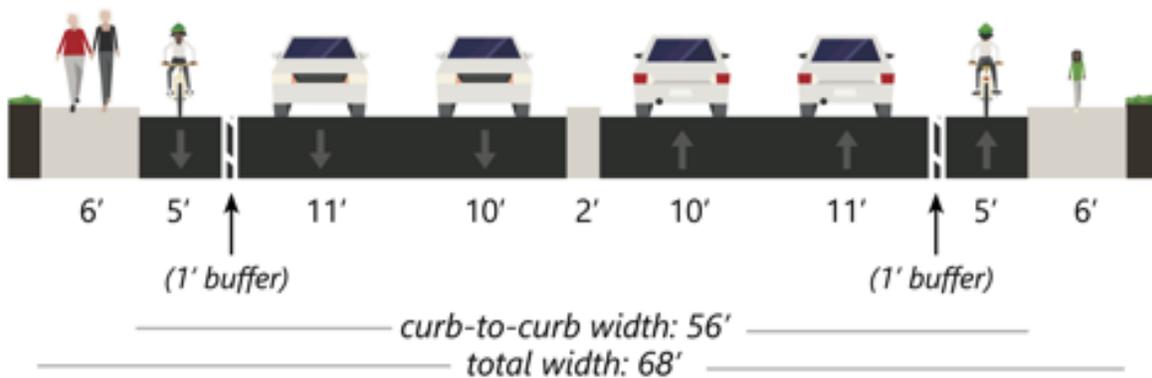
ALTERNATIVE CROSS SECTIONS – EAST: I-5 OVERPASS TO STEPHENS STREET
